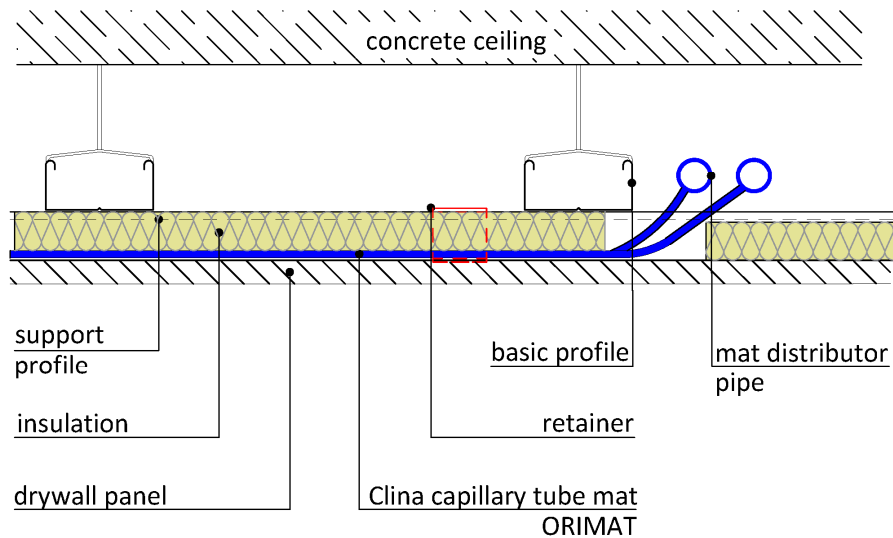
section view ceiling structure with retainer- longitudinal
